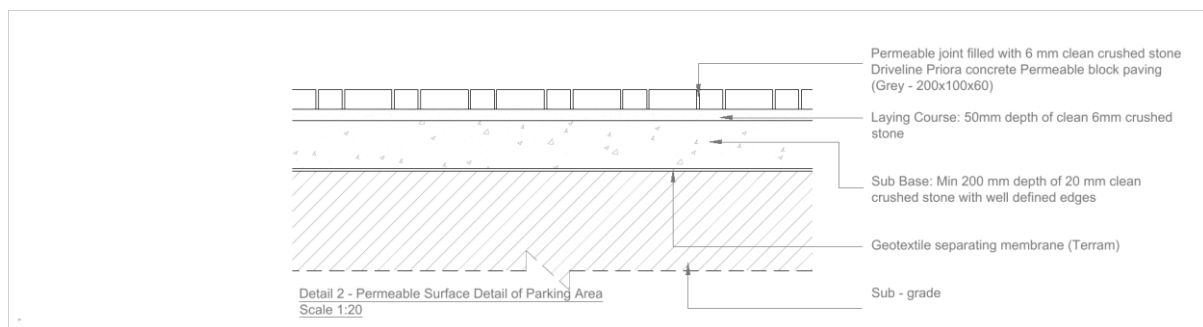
Permeable paving construction detail (extract from AVAN Plans Drawing A2010-07, Detail 2)
